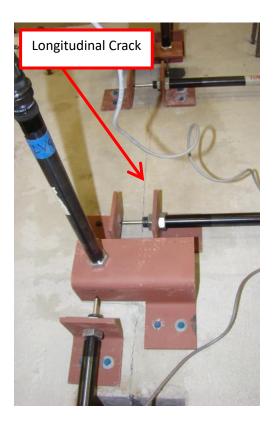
Longitudinal Crack on Specimen A-1 at a Tie Bar Strain of $0.75\epsilon_y$
